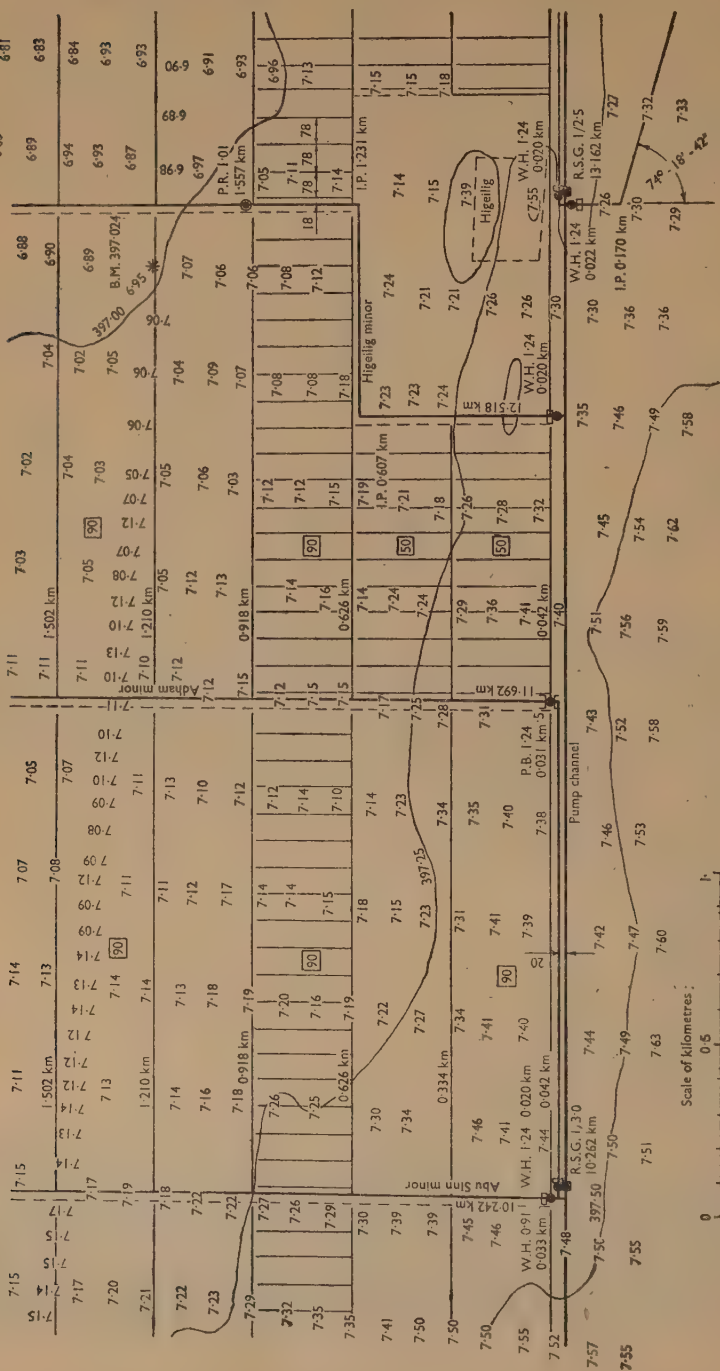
FINAL LAYOUT OF CANALIZATION : PART OF GONEID PUMP SCHEME
